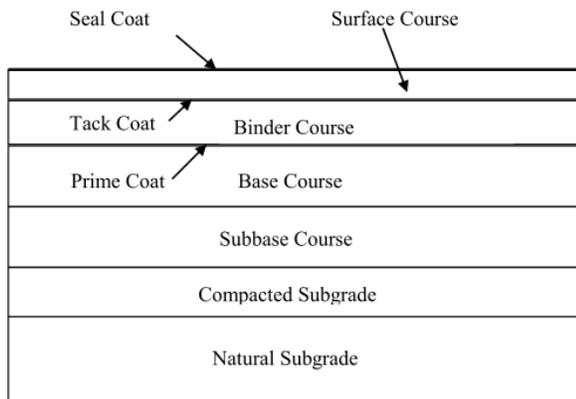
Cross section of a flexible pavement (Modified from Huang, 2004)
